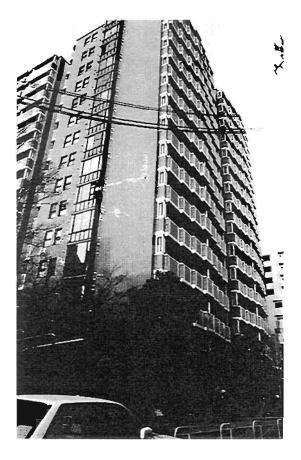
Damage in main shear wall of 12 storey flats
